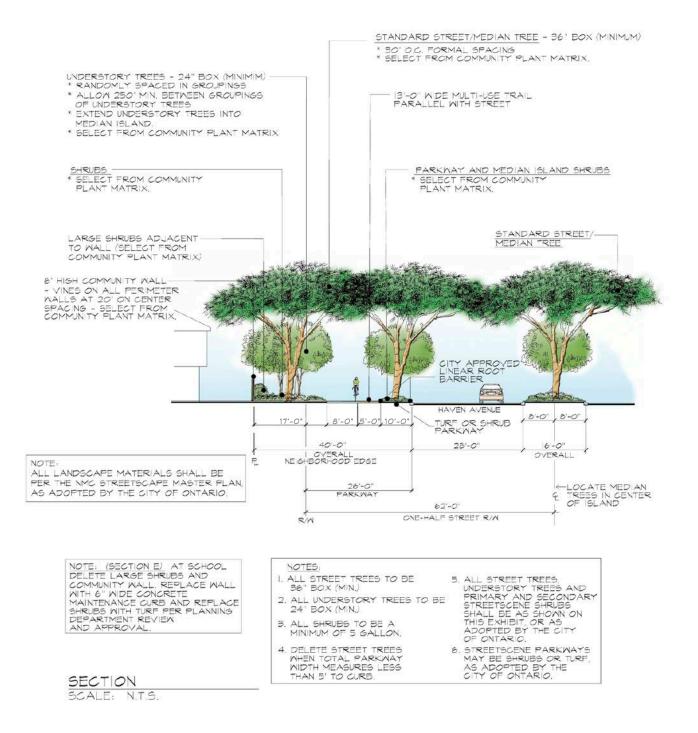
HAVEN AVENUE STREETSCENE AT RESIDENTIAL
